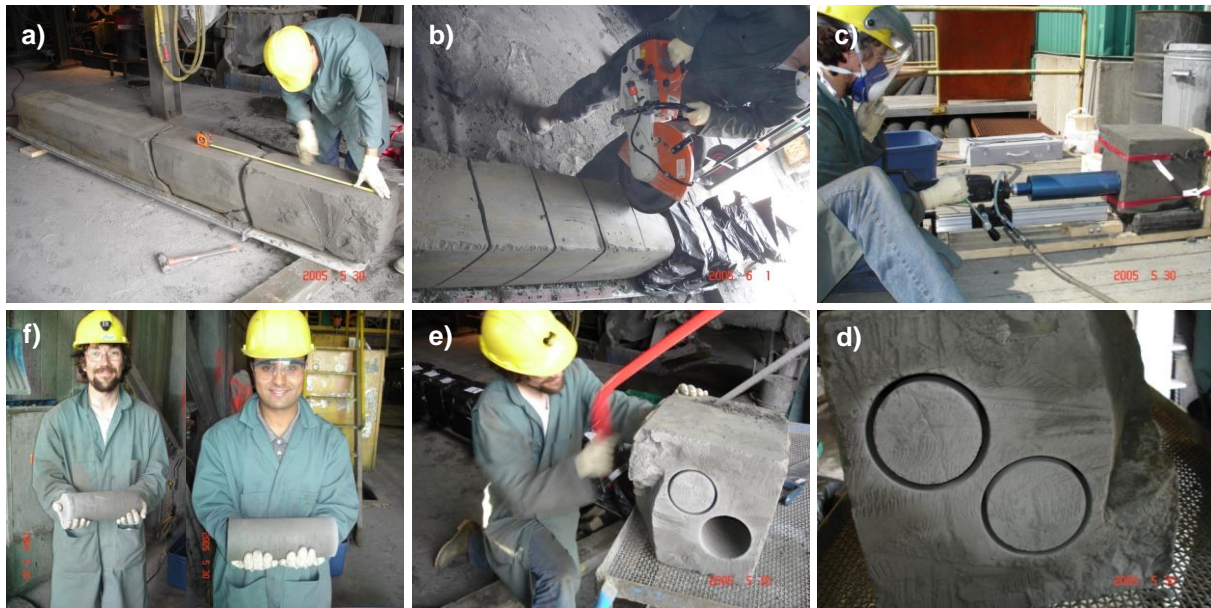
Columns dismantling: a) blocks sizing, b) blocks cutting, c) specimen coring, d) end of coring, e) specimen cutting, f) obtained test specimens.
